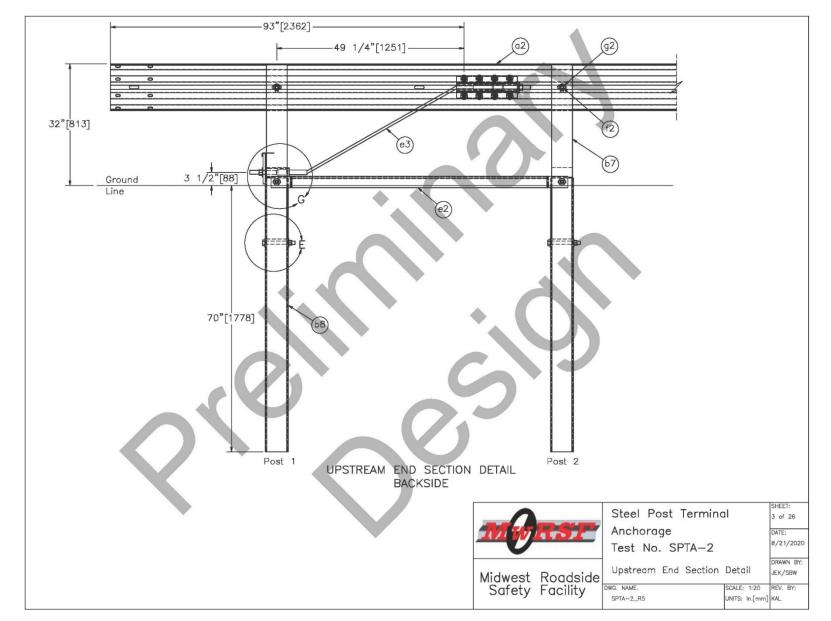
Upstream End Section Detail, Test No. SPTA-2
